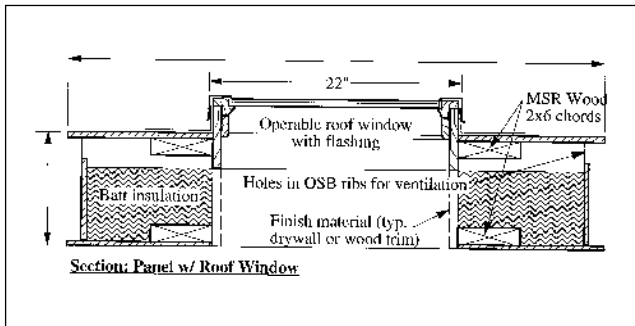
Cross-Section of Panel @ Roof Window, With MSR Structural Reinforcement
